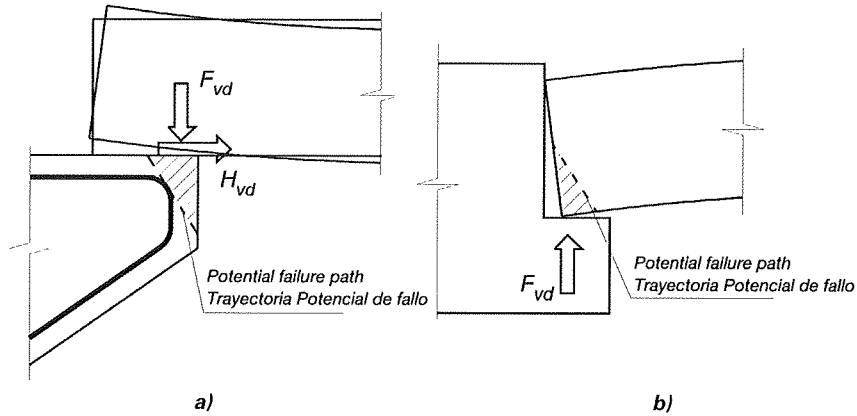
Spalling failure mechanism in supports for precast members
